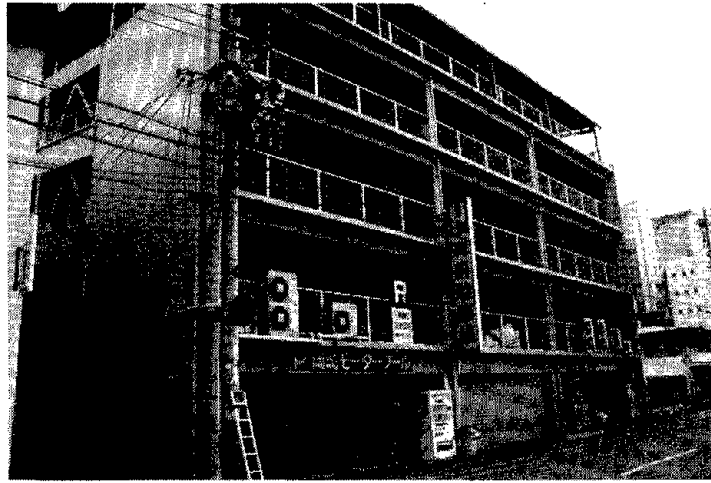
Elevation of a four-story, steel-braced parking structure
